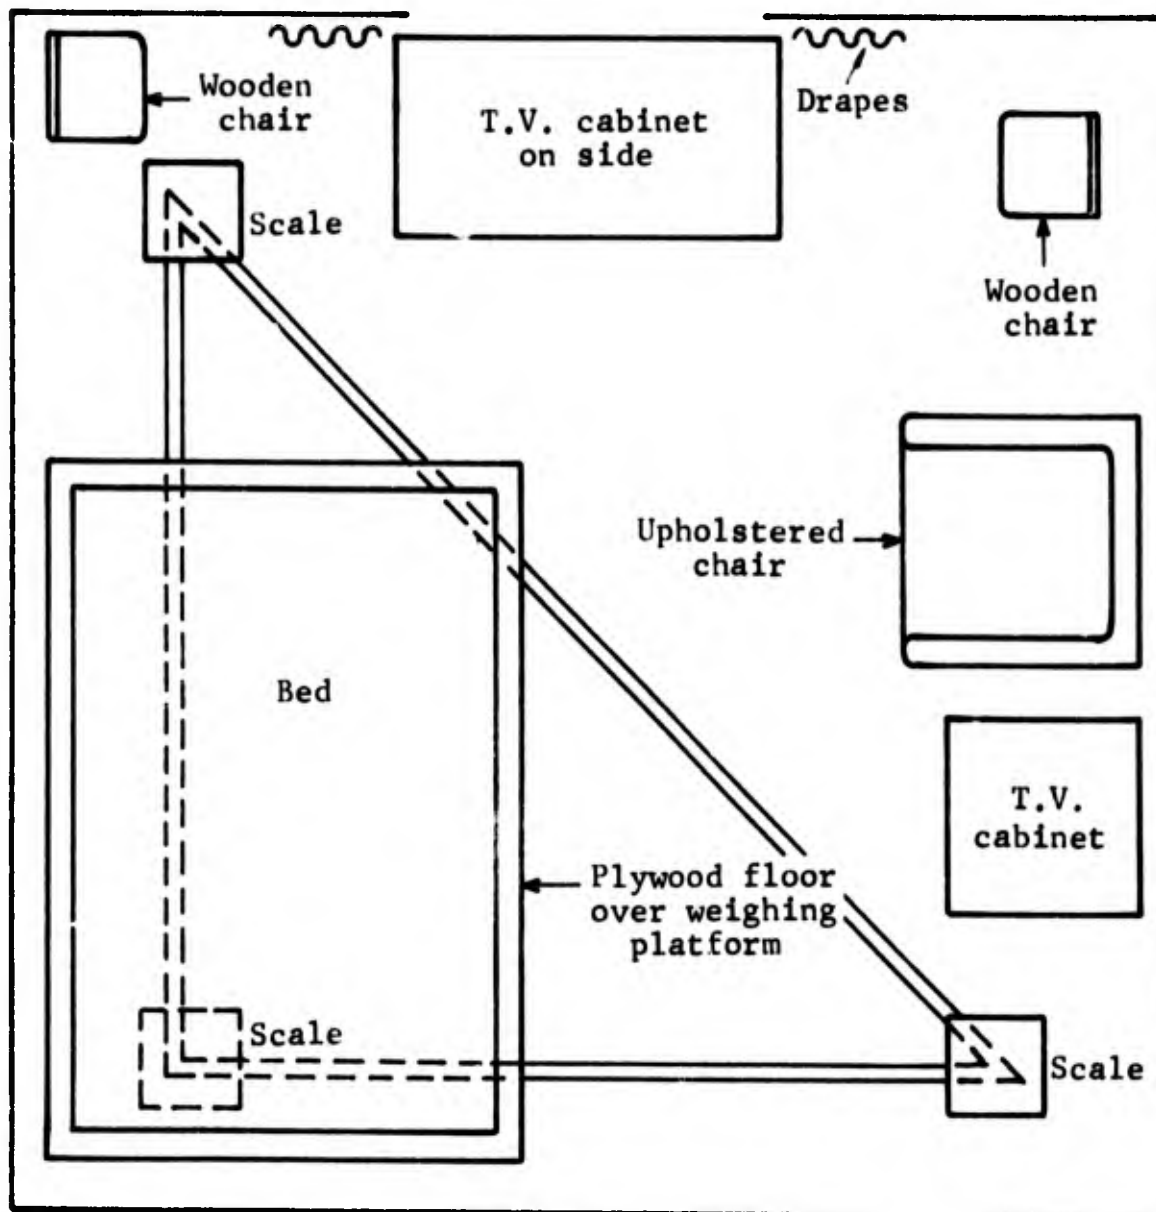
TYPICAL FURNITURE ARRANGEMENT FOR BEDROOM
